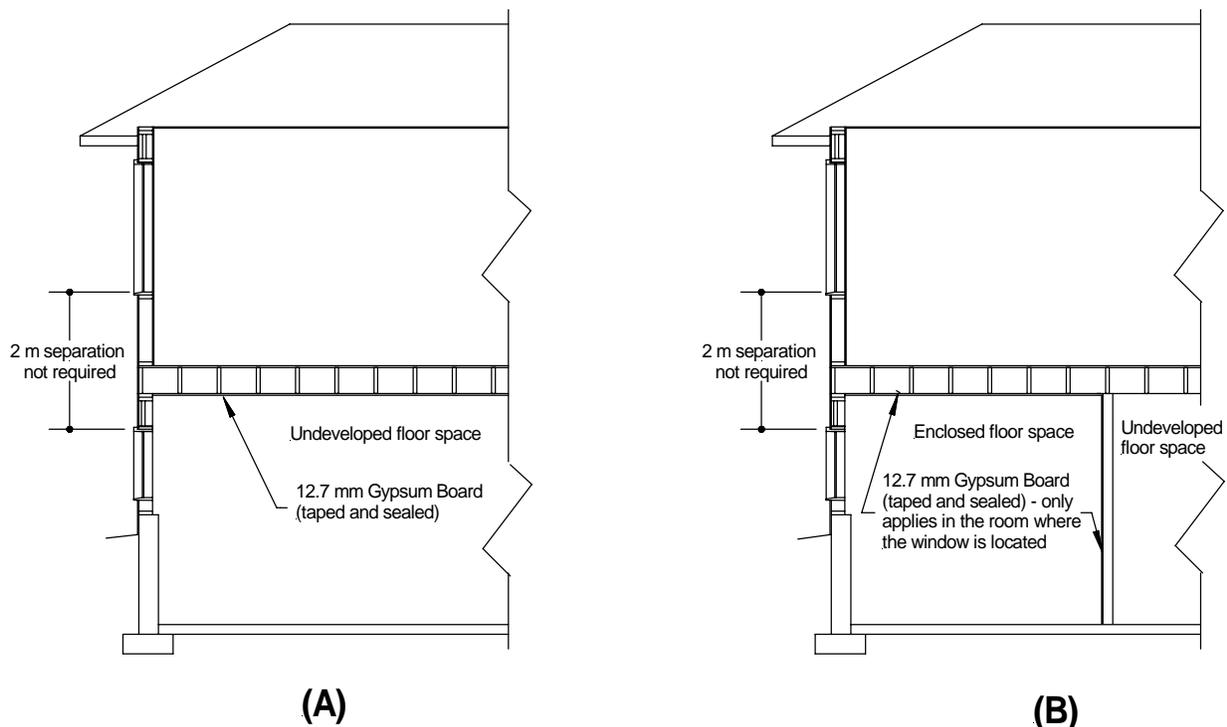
Glazed Openings Separated by a Protected Floor-Ceiling Assembly
